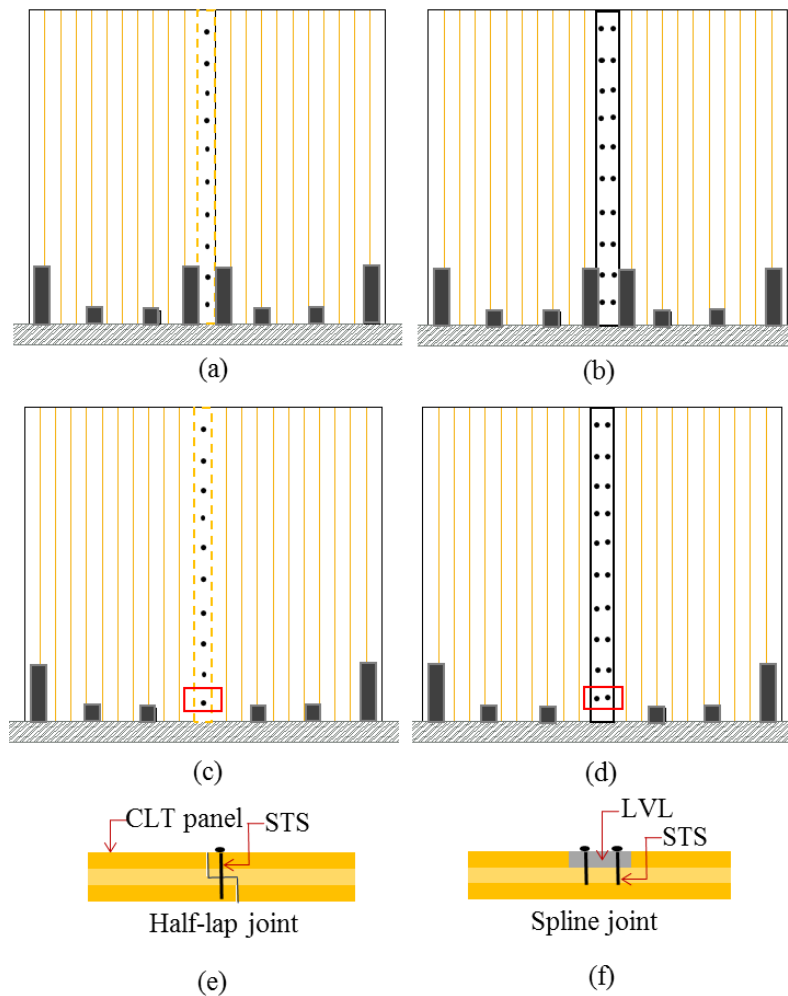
Coupled shear wall with: (a) 4-HDs and half-lap, (b) 4-HDs and spline joints, (c) 2-HDs and half-lap, (d) 2-HDs and spline joint, (e) half-lap schematic, (f) spline joint schematic
